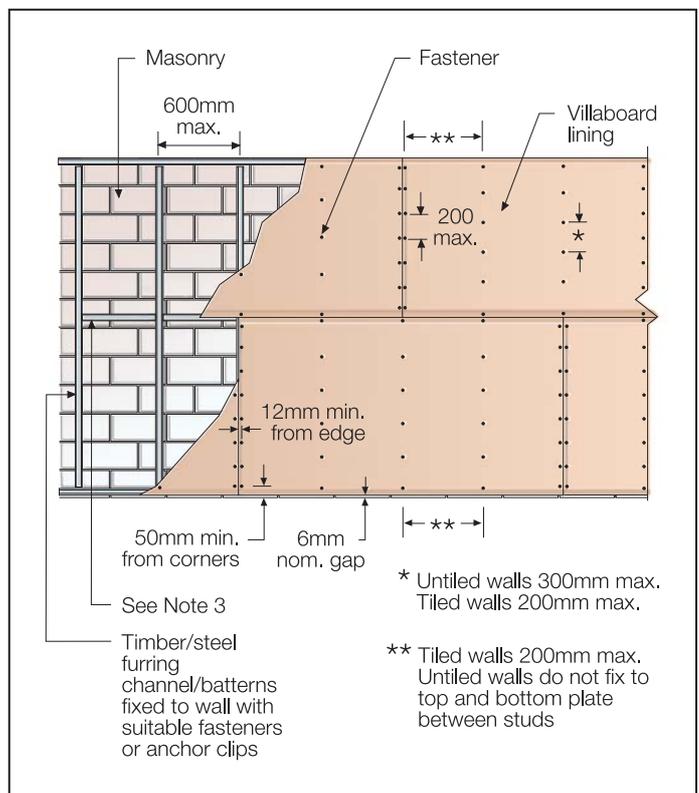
BATTEN / FURRING CHANNEL - HORIZONTAL LAYOUT
